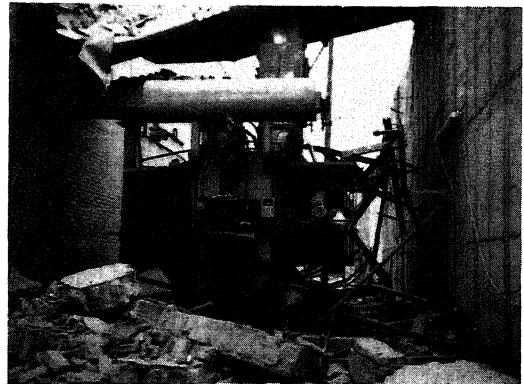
Lowshan power plant transformer damage due to the partial collapses of last storey walls
